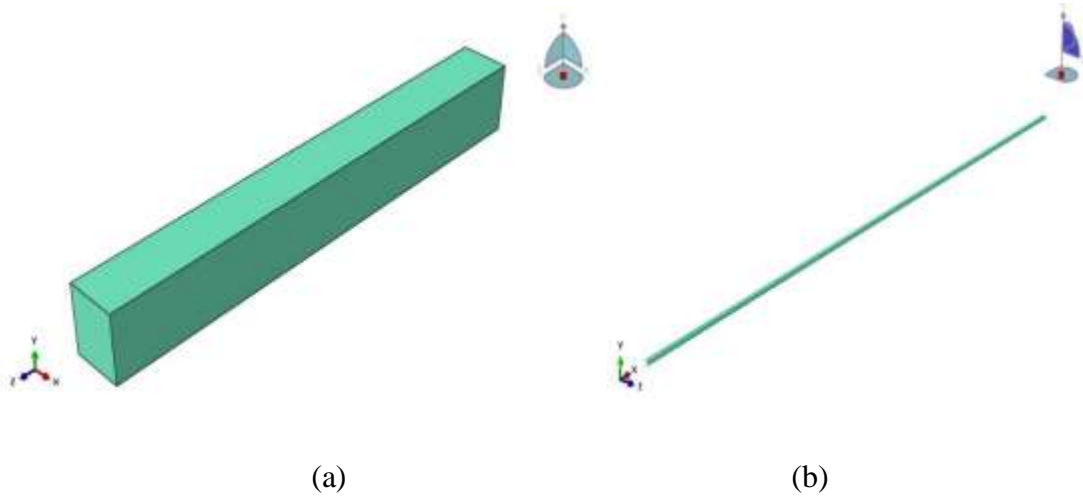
2 : (a) Beam model as 3D solid element (C3D8), (b) Longitudinal rebar model as 1D truss element (T3D2)
